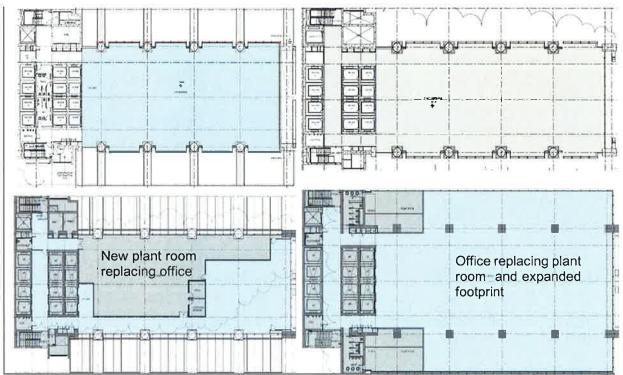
approved (top) and proposed (bottom) Level 1 floorplan
